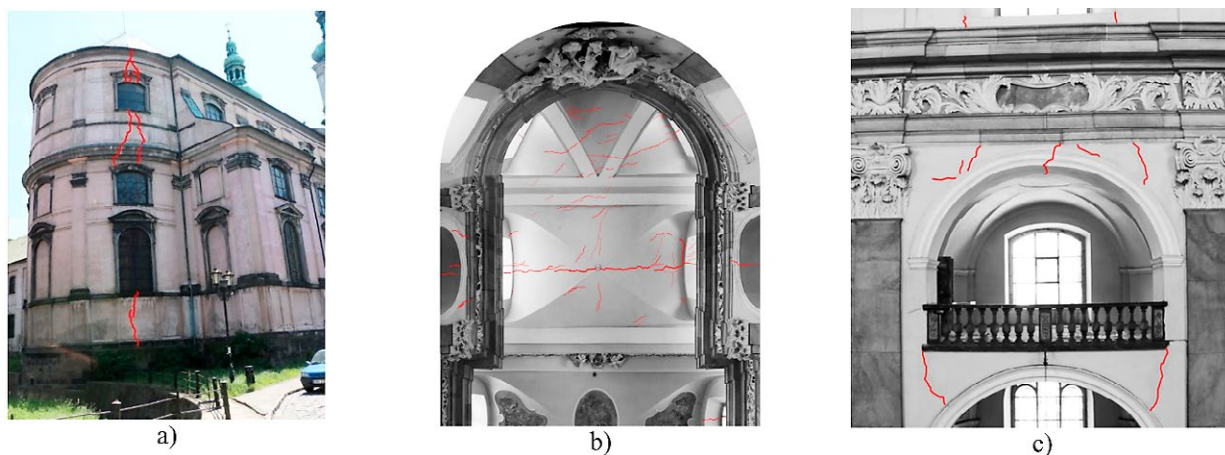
Church damage: outside (a), inside (b), inside (c); photo by Ł. Bednarz.
